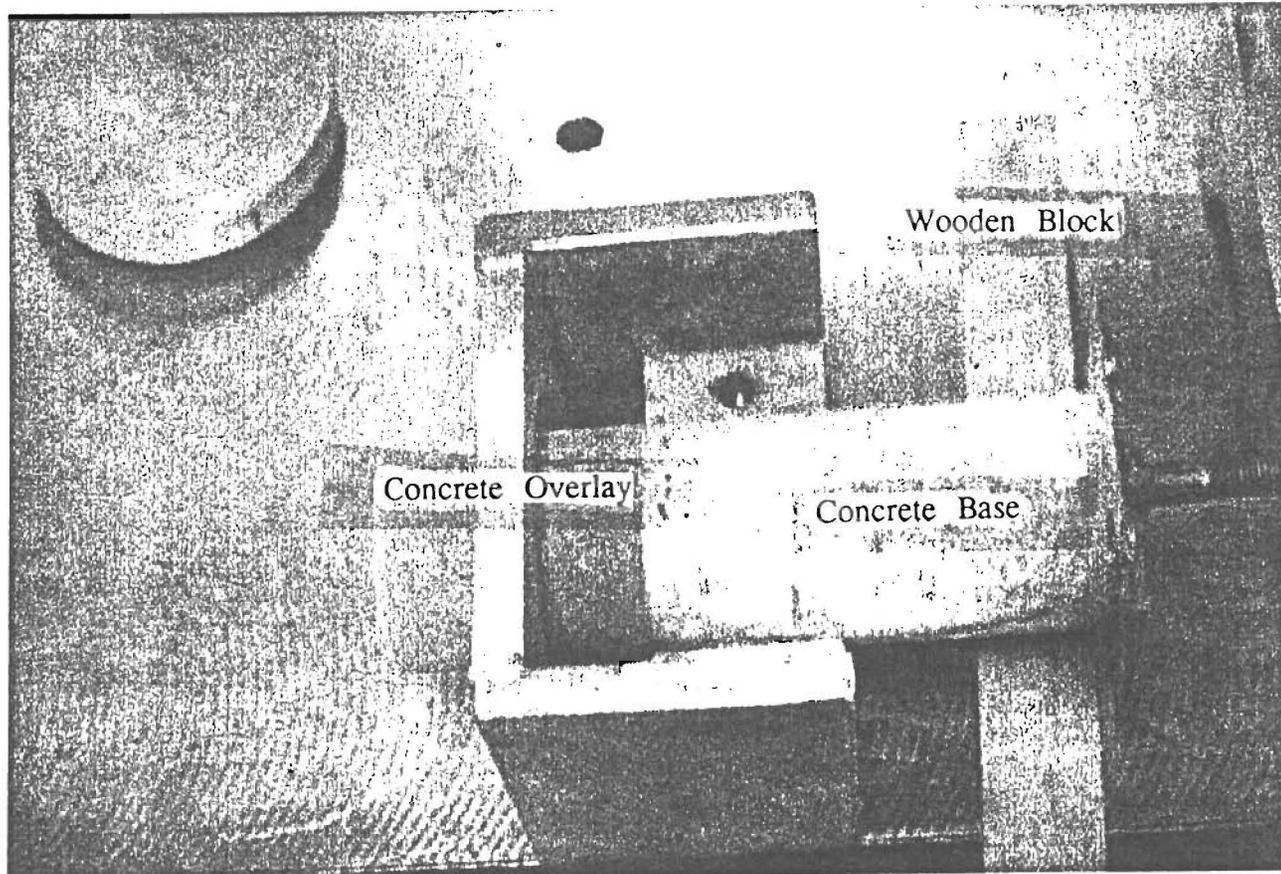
Concrete Overlay Specimen Placed in Shear Apparatus
